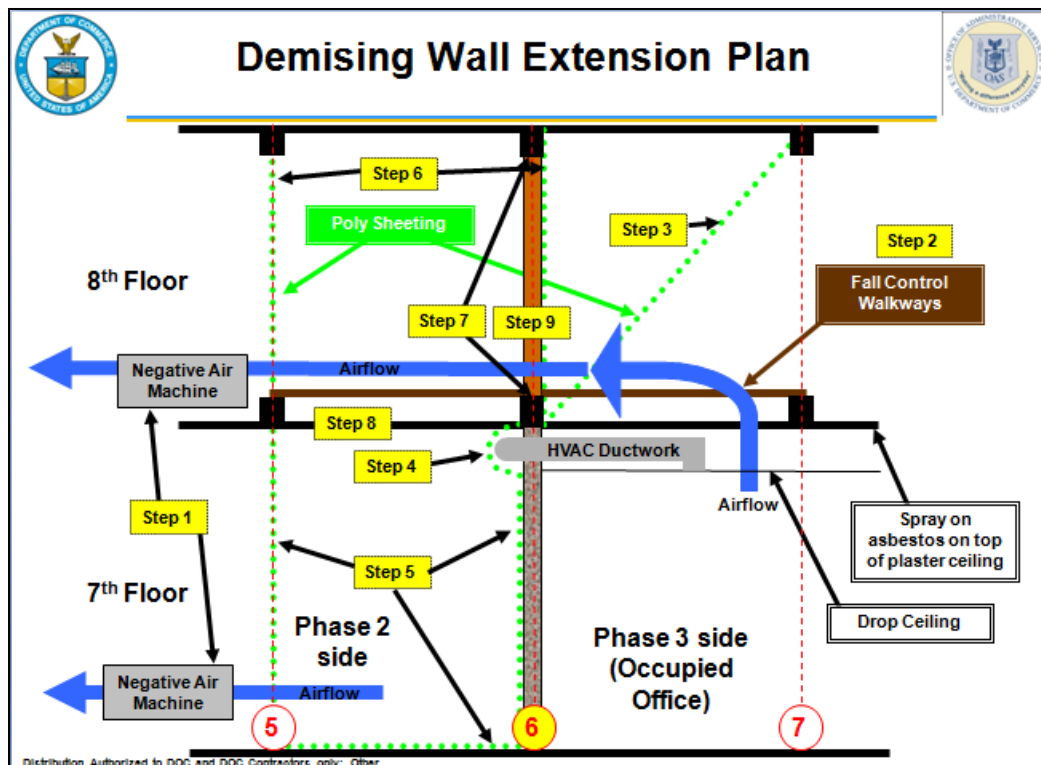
Demising Wall Extension Plan proposed by Gilbane-Grunley to GSA
